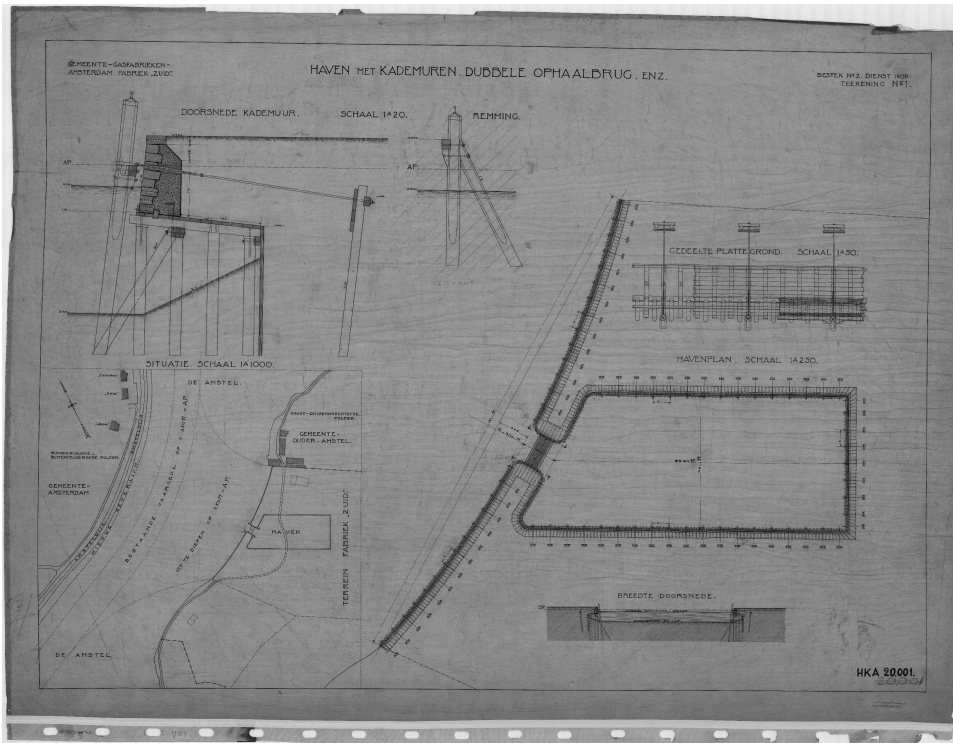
Design plan Quay wall Amsterdam, part 1 (Gemeente Amsterdam, 2021)
